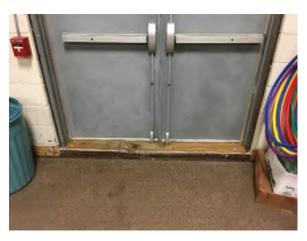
An elevation change exists at the exterior doors in the $\mbox{\ensuremath{\mbox{gym}}}.$
